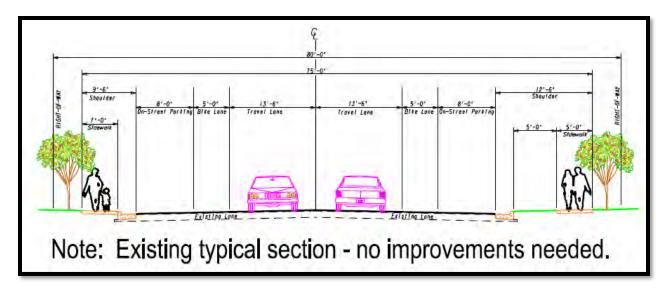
Proposed Typical Section – Alternative 2 – 20<sup>th</sup> Ave. from West First St. Extension to Georgia Ave.
